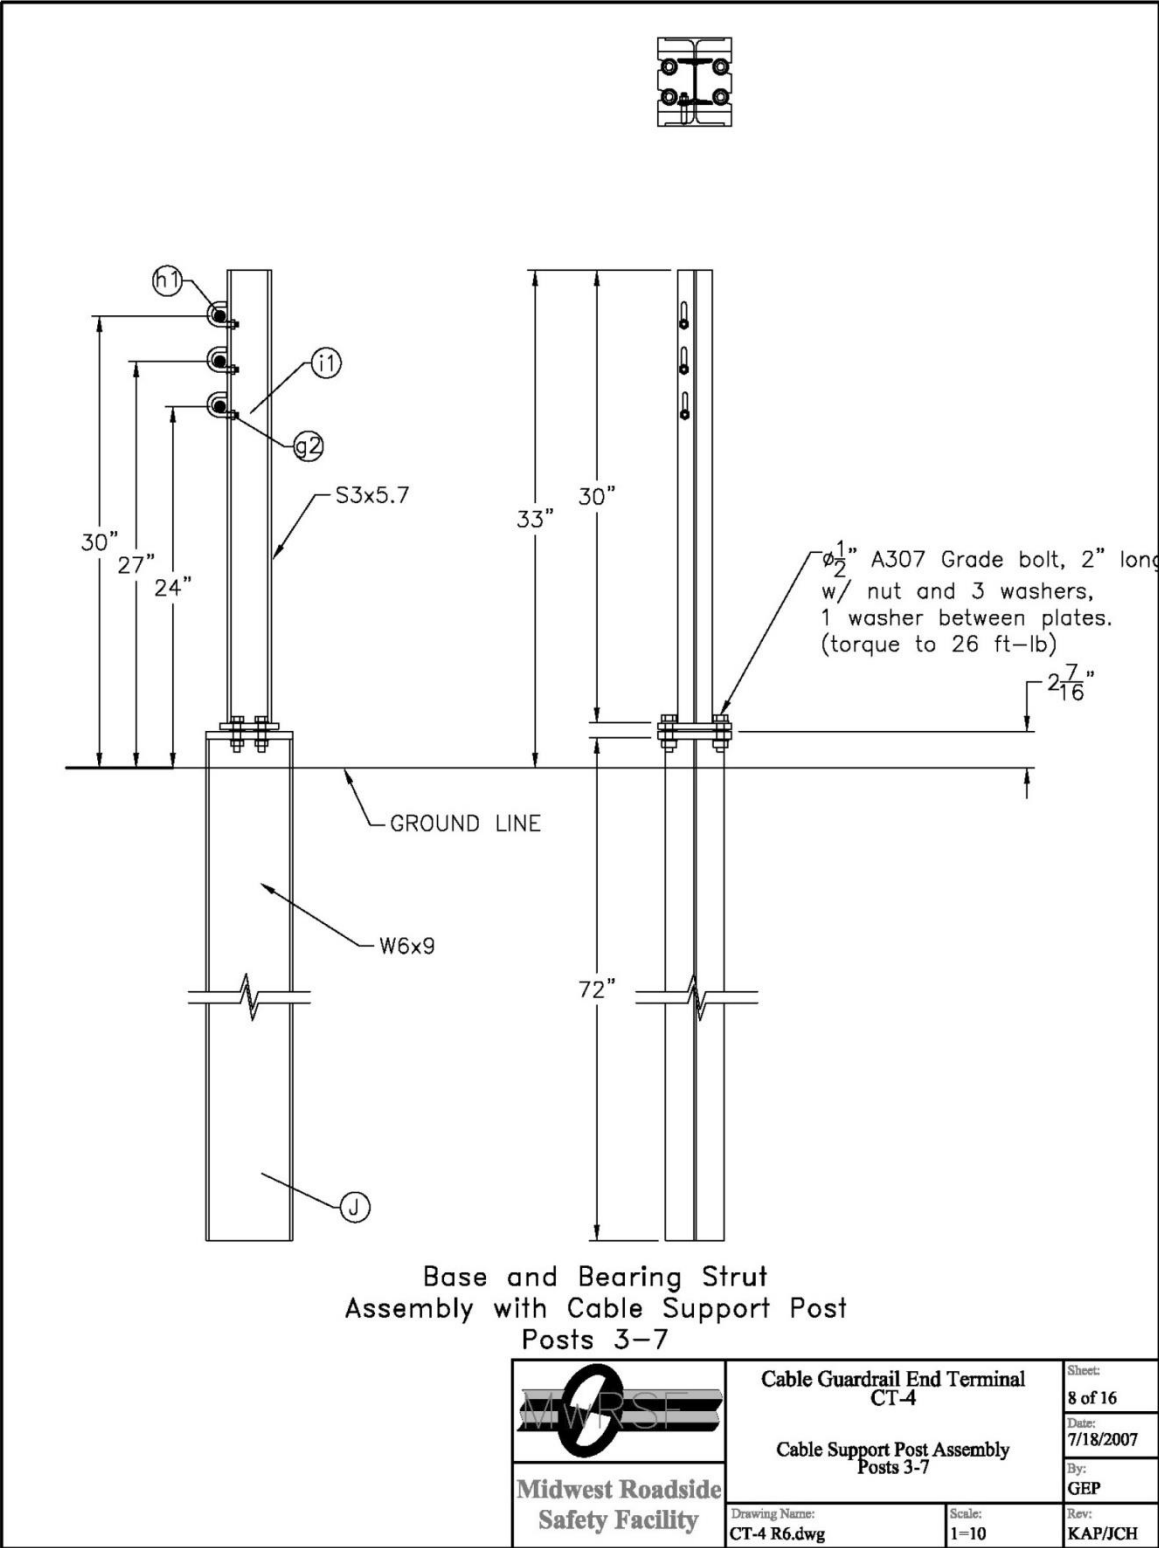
Slip Post Details, Cable Terminal Testing, 2000-2007 [65]
